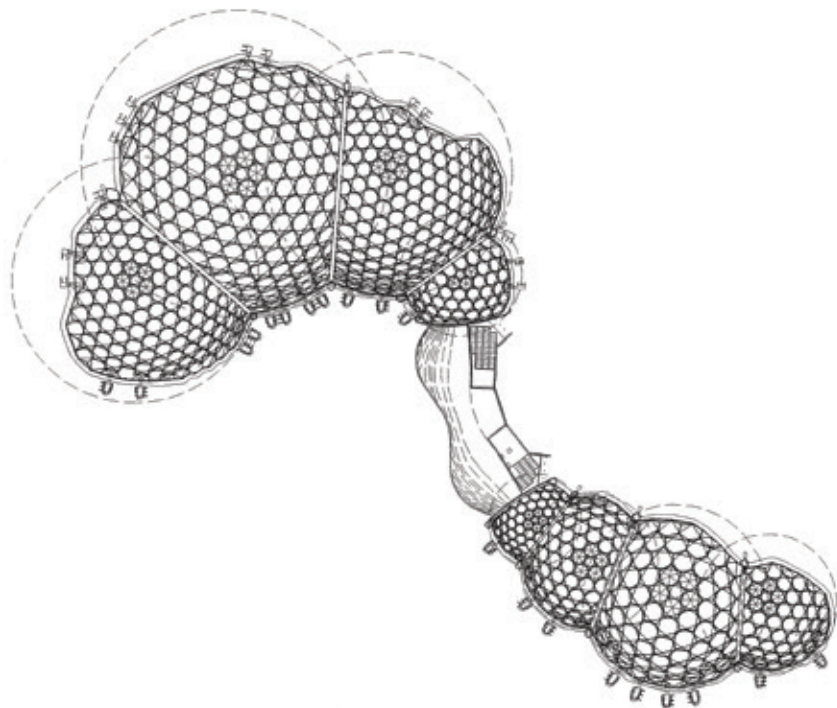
Plan of the eight intersecting Biomes of the Eden Project
